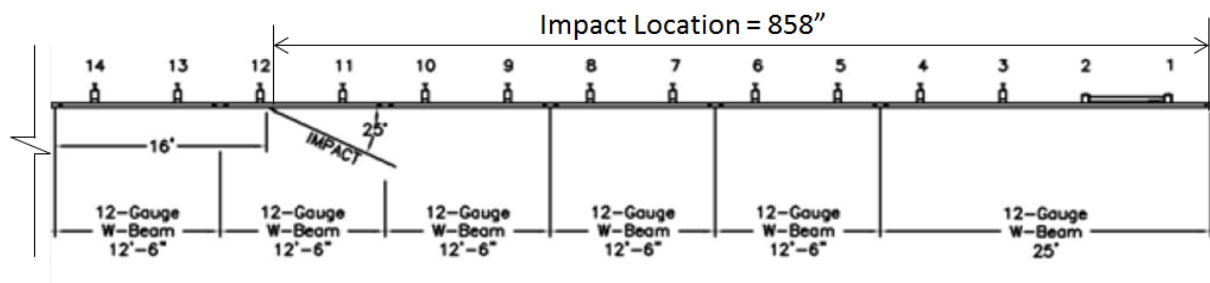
CIP for Single W-Beam Guardrail System at Full-Post Spacing.
